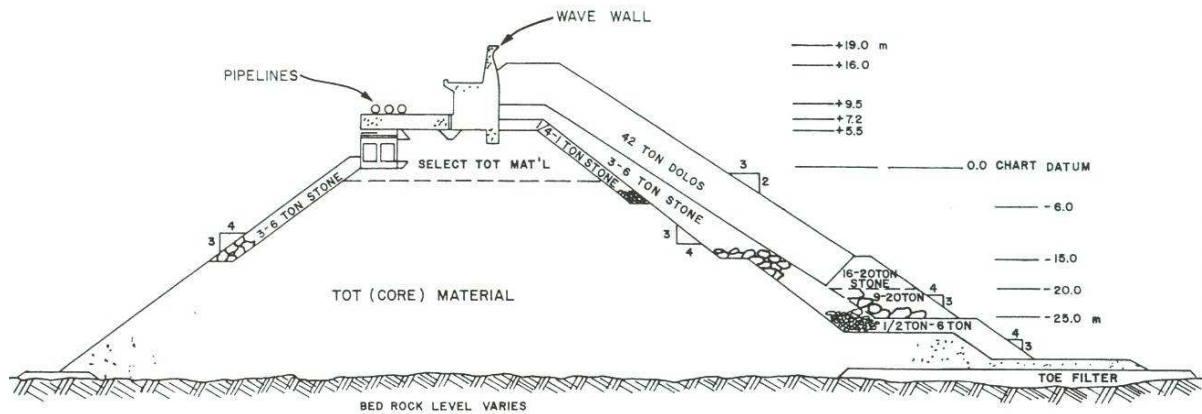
Breakwater cross-section of the final design (Port Sines Investigating Panel, 1982)
